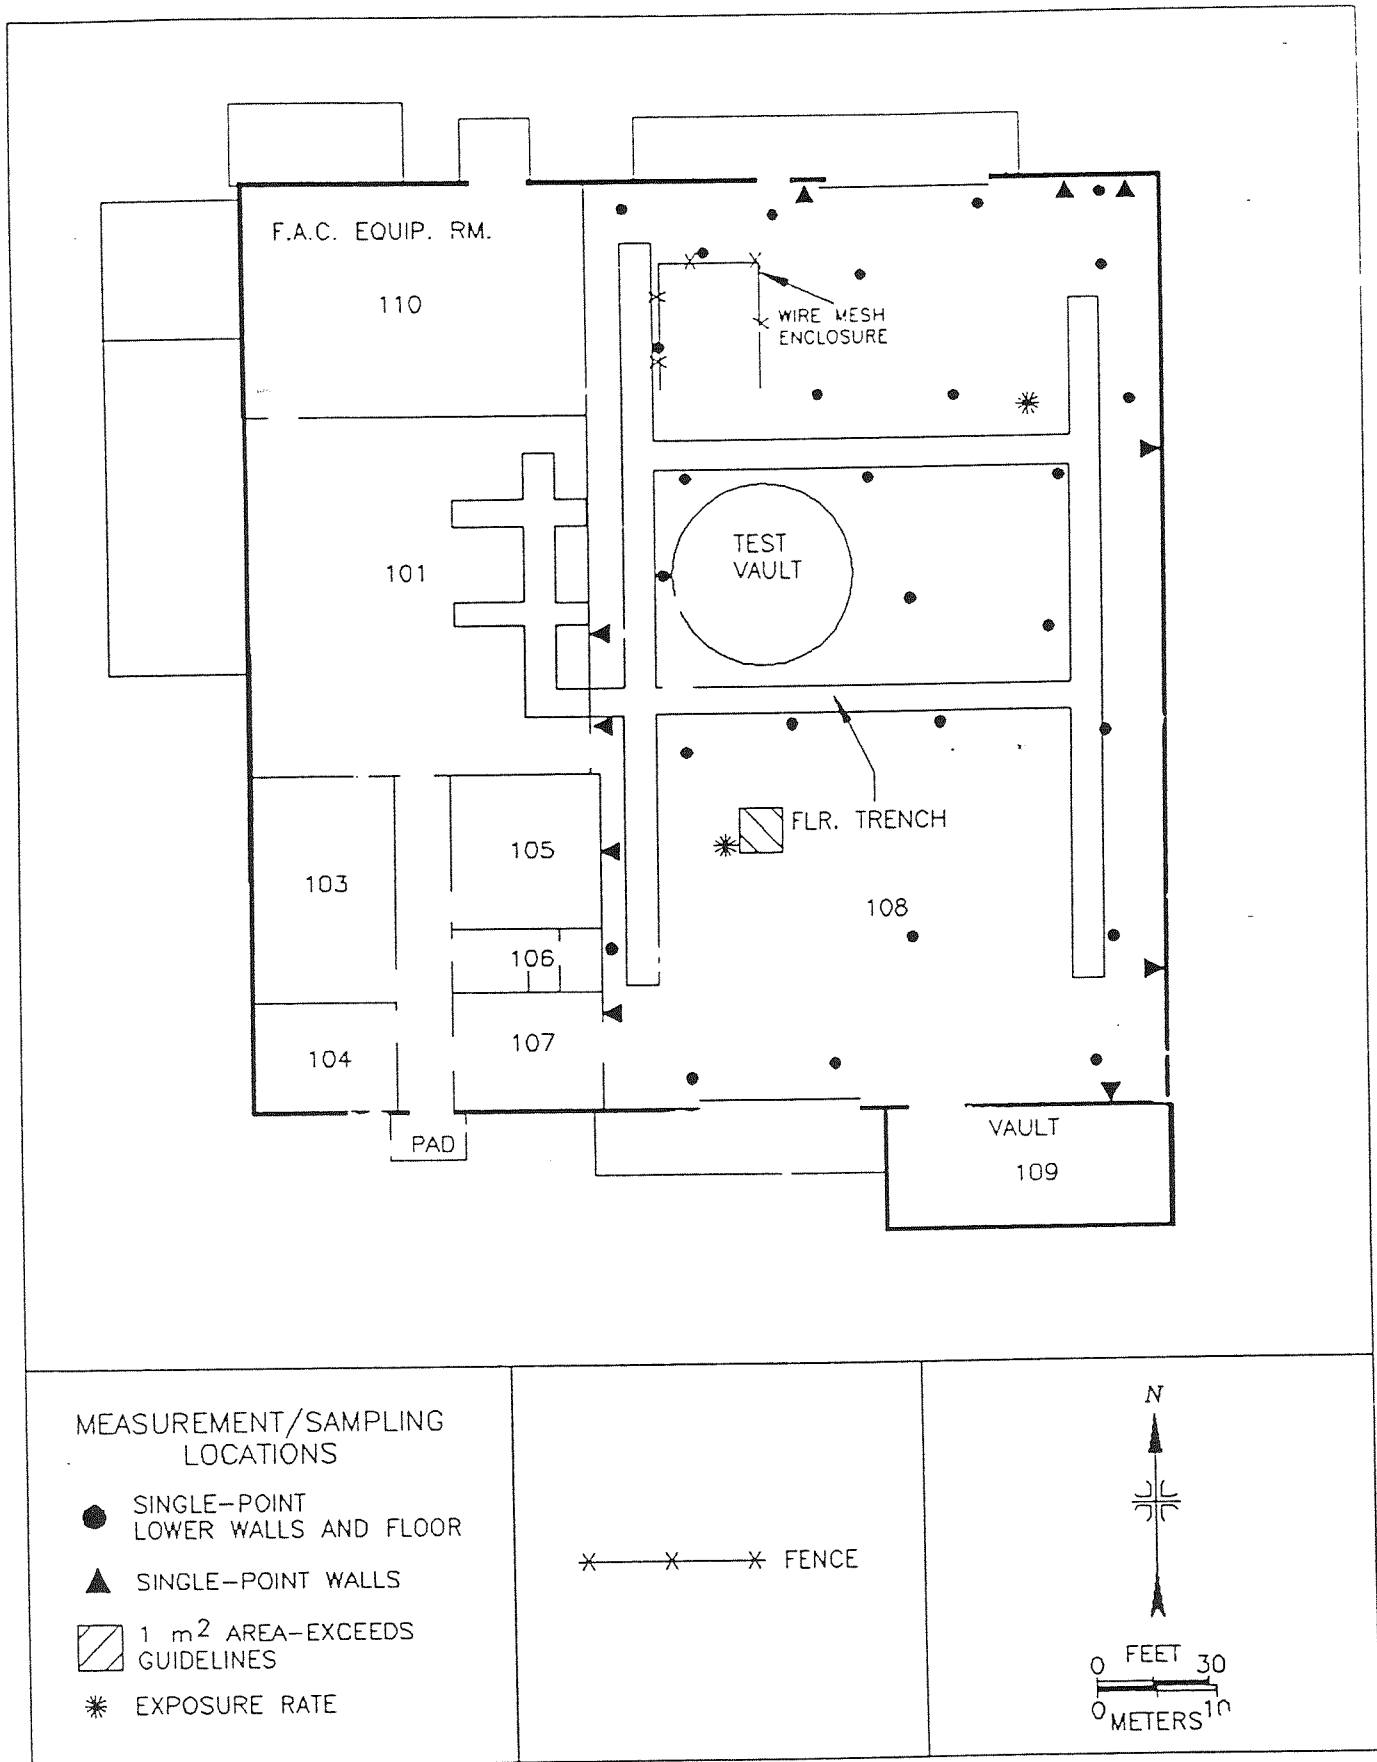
Building T019 – Floor Plan and Measurement and Sampling Locations
